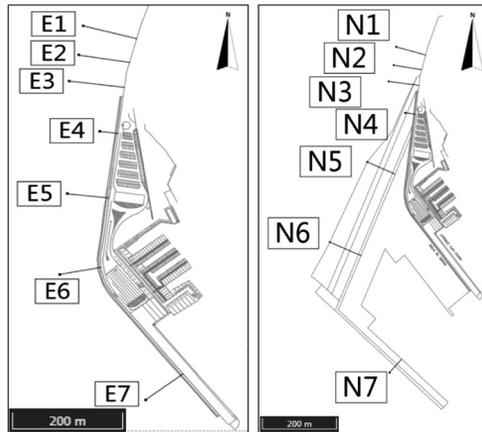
Study sections. Existing port (left); Planned expansion (right).
